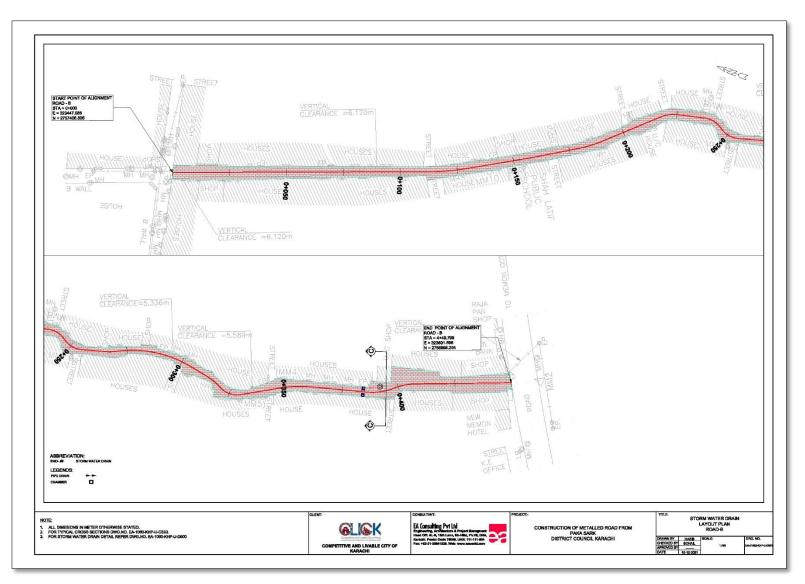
Layout Plan for the Proposed Rehabilitation of Paka Sarak Layout - 03
